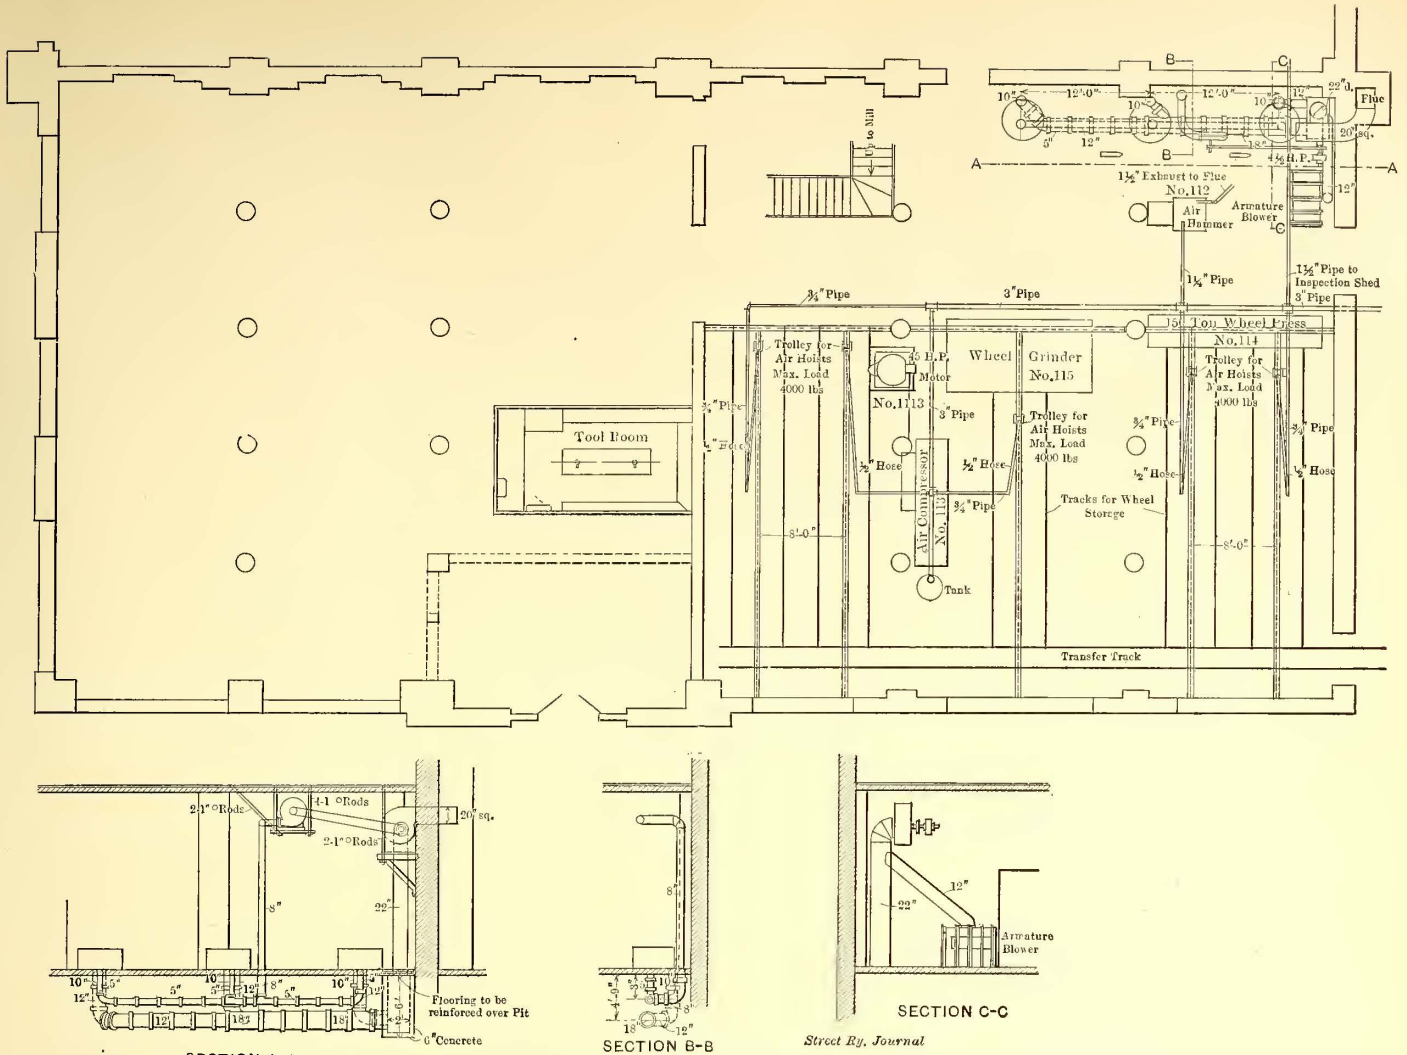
DETAIL PLAN AND SECTIONS OF BLACKSMITH SHOP AT THIRTY-SIXTH STREET
